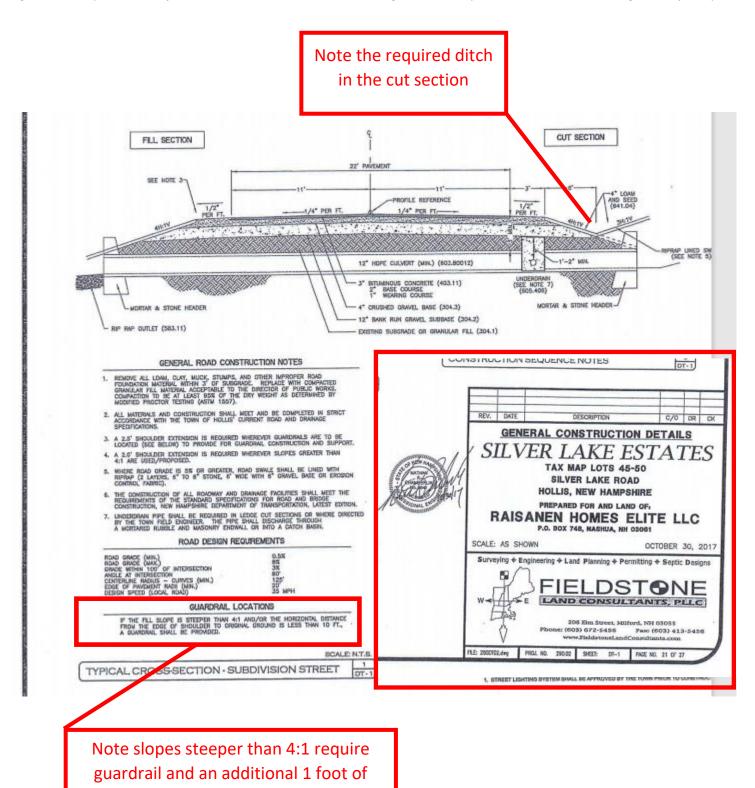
Excerpted Sections of the Silver Lake Estates Plan (Cobbett Lane) Signed 10-30-17 by Fieldstone Consultants; Rectangle Added for Emphasis
